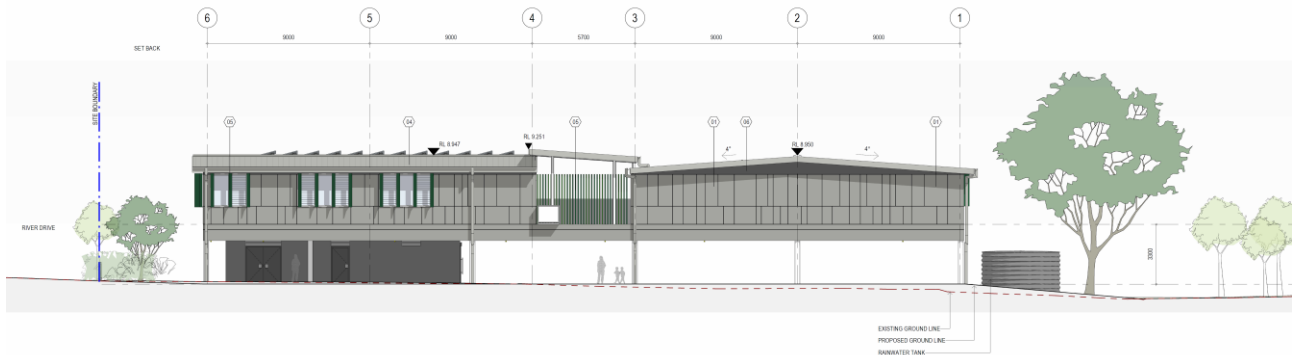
Proposed south-western elevation (Source: Pedavoli Architects)
